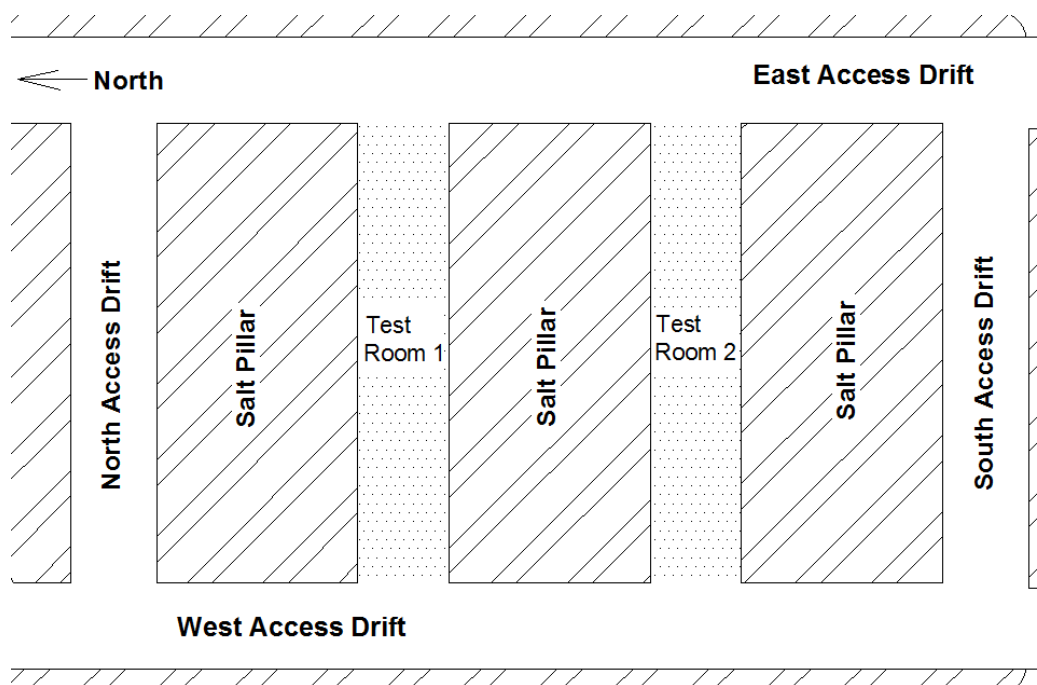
Configuration of access drifts and test rooms in a generic underground research facility.
